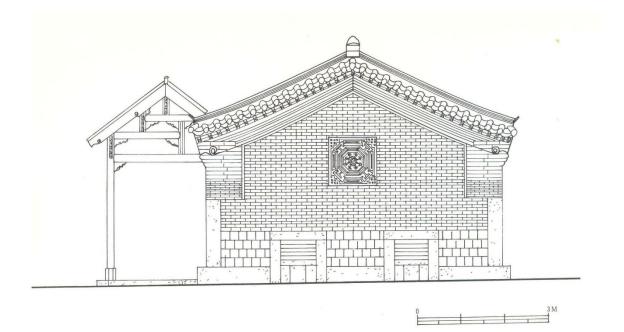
Seonhyangjae Right Elevation (N. Zu 2003)
